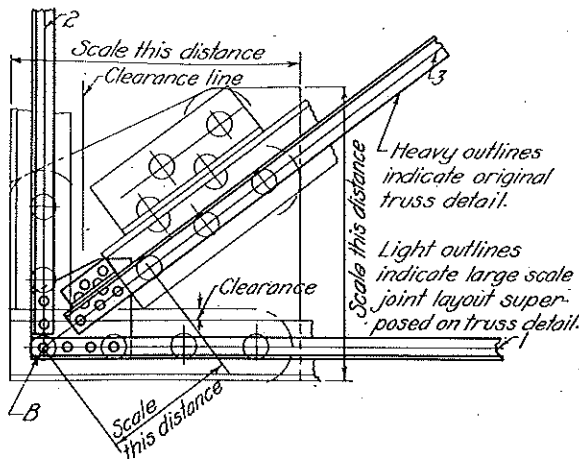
Large-scale joint layout for obtaining detail dimensions.
